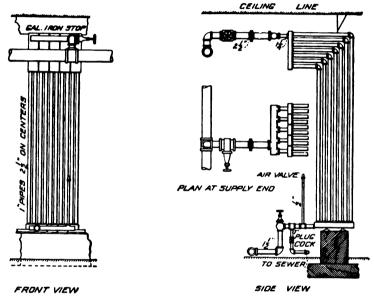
Heater Especially Adapted to Ventilation where Air does not Have to be Heated above 70 to 80 degrees F.
